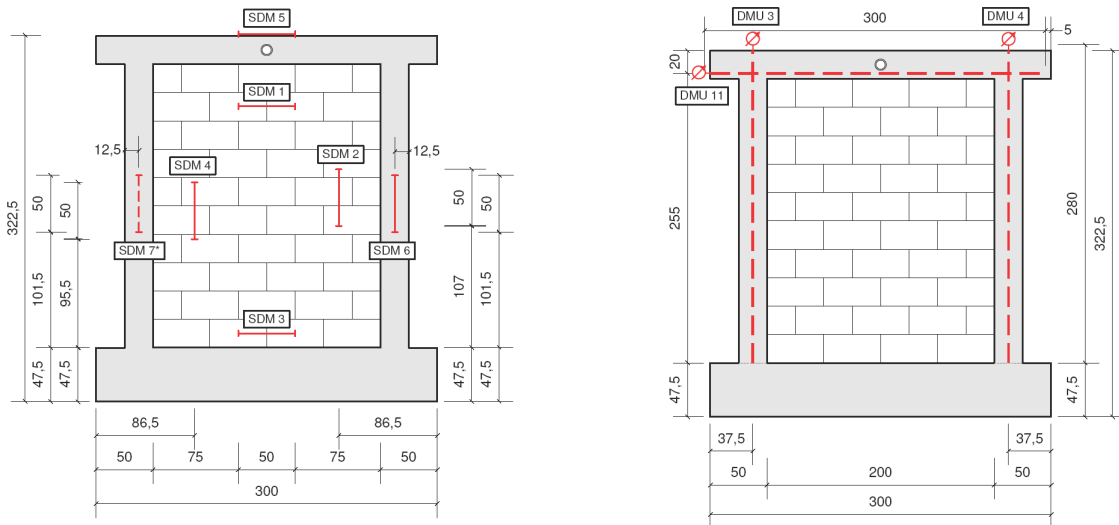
Plan of measurement points for shrinkage of the wall (left: mechanical extensometer; right: steel bars in cladding tubes with digital meter)
